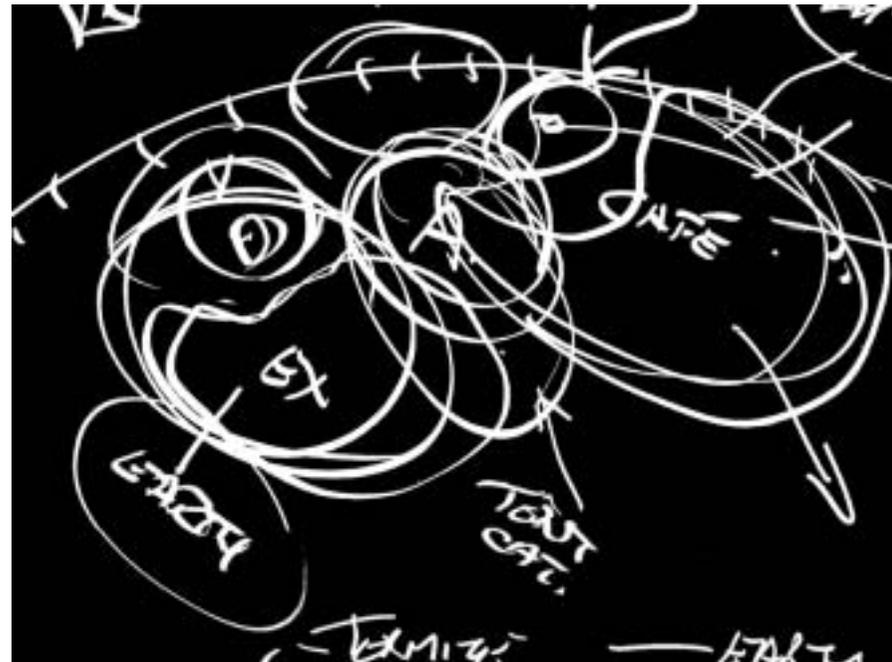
Conceptual plan showing 'two wing' arrangement about the atrium in the middle. The monorail wraps around the back of a building through the station which is connected to the atrium.
